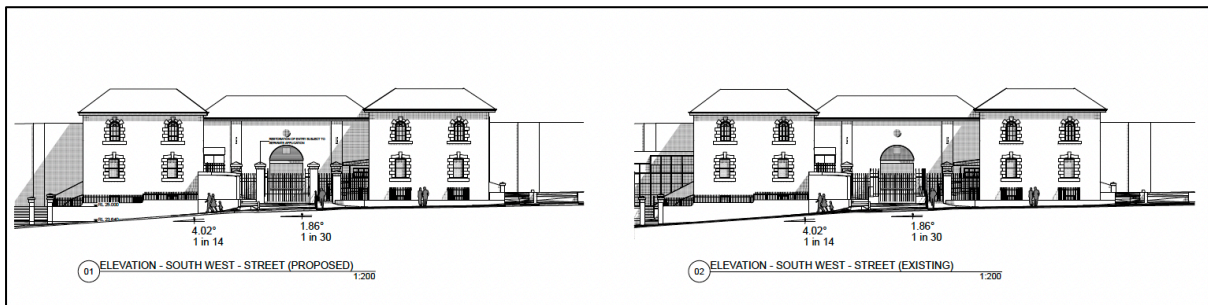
Governor’s Residences Street Elevation (South-west). Buildings Subject of this Development Application.
